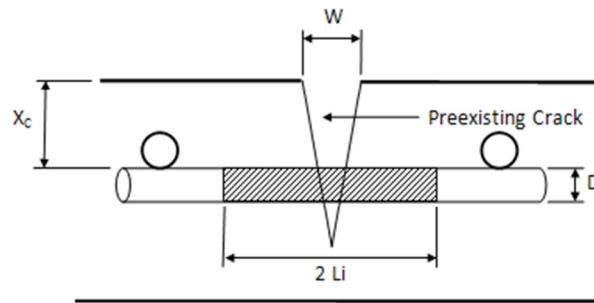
Conceptual crosswise intersection of reinforcing wire by preexisting crack
